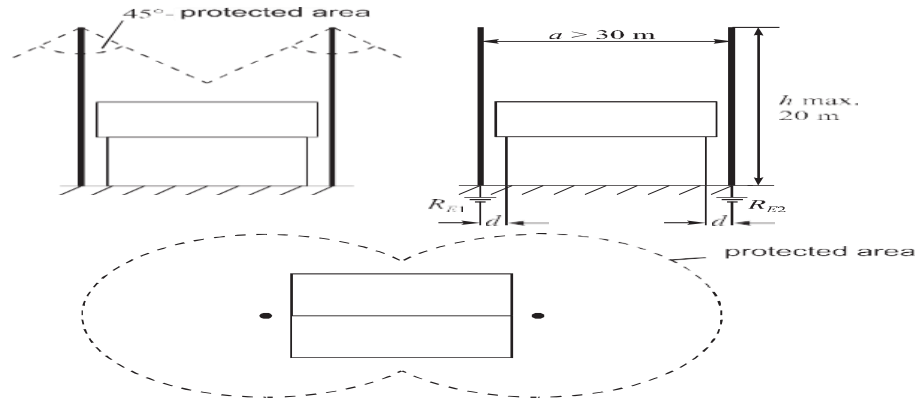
Air terminal - lightning rod with protected area greater than 30 m [79]
